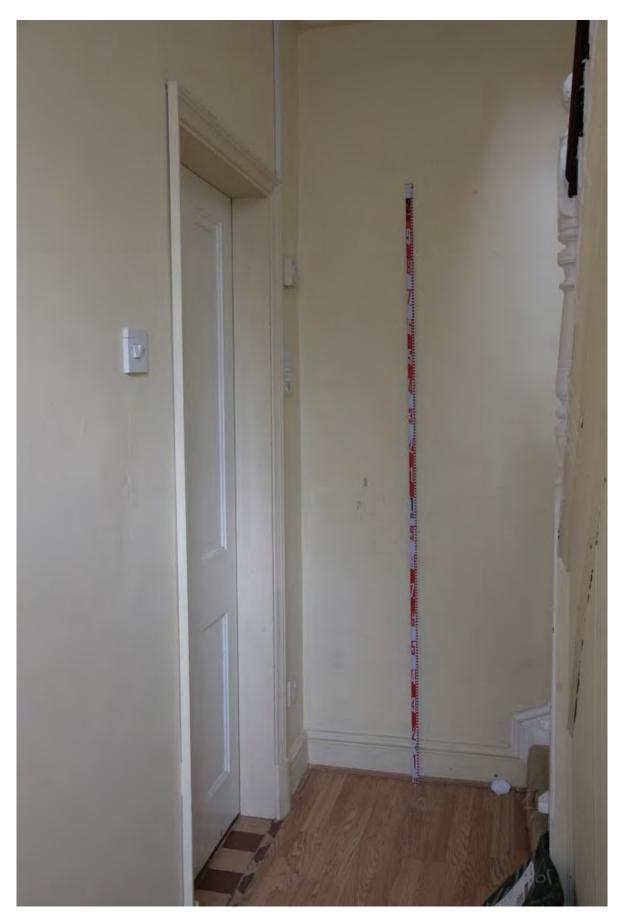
Entrance Lobby, looking north-west (LMSC16 D100 (55))
